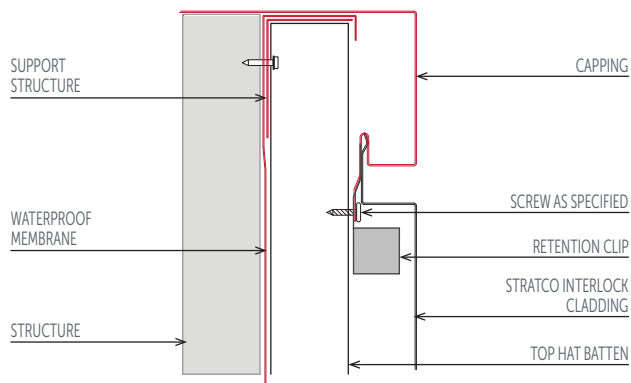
TOP OF FACADE CAPPING DETAIL
